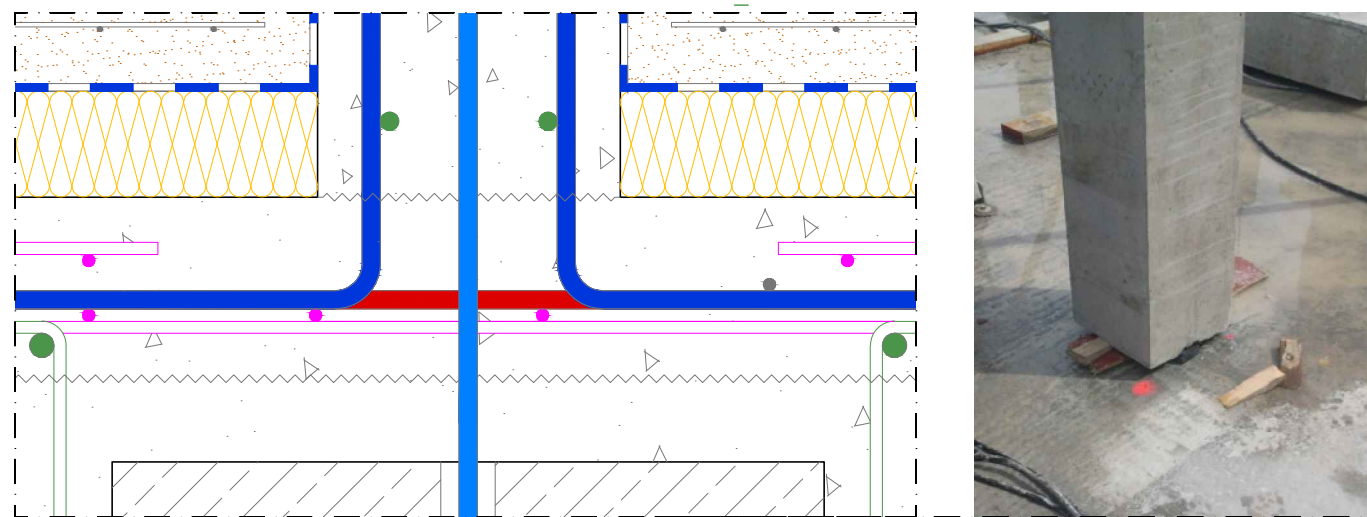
UNION WALL - FLOOR \_ S:1/10
